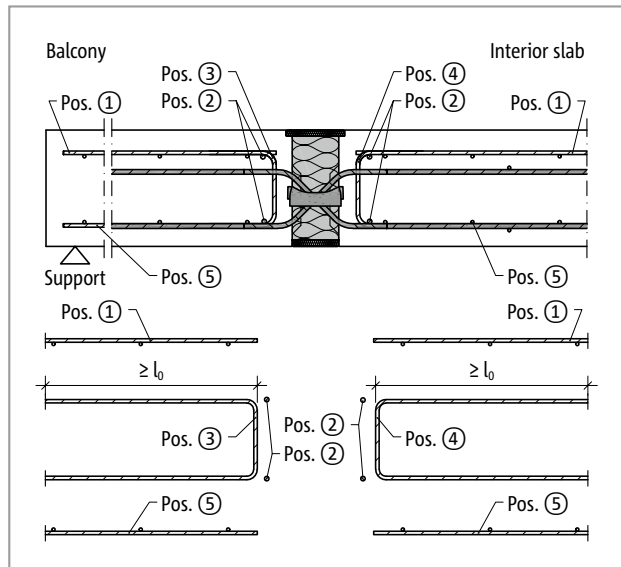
Schöck Isokorb® T Type CQ-VV6 to CQ-VV10: On-site reinforcement
